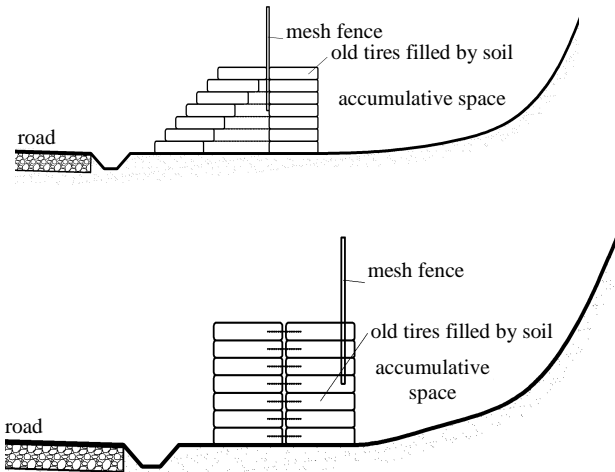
Schematic cross sections of retaining reinforced earth wall with old tires facing
